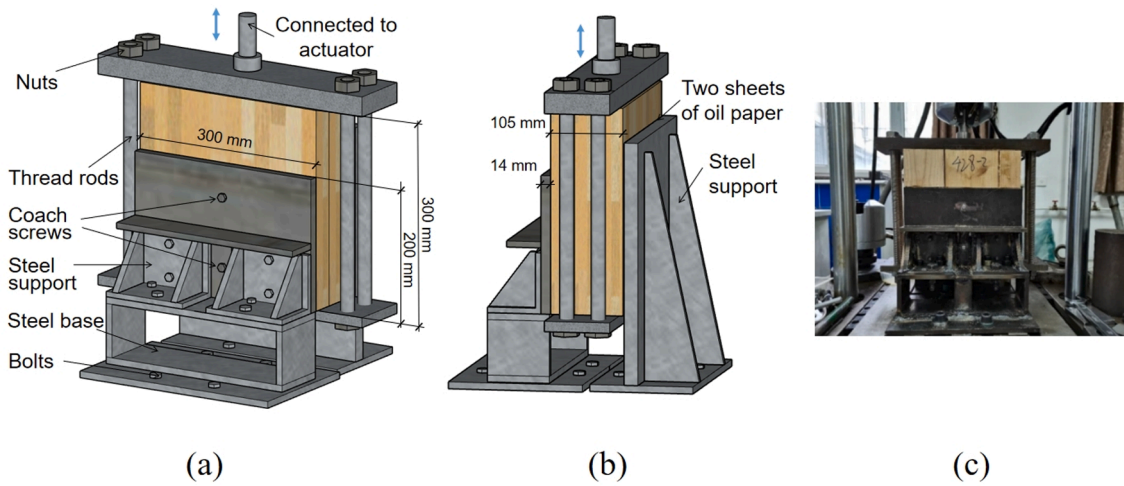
Schematic of a specimen from (a) left front view and (b) left rear view; and (c) a specimen mounted on the machine.
